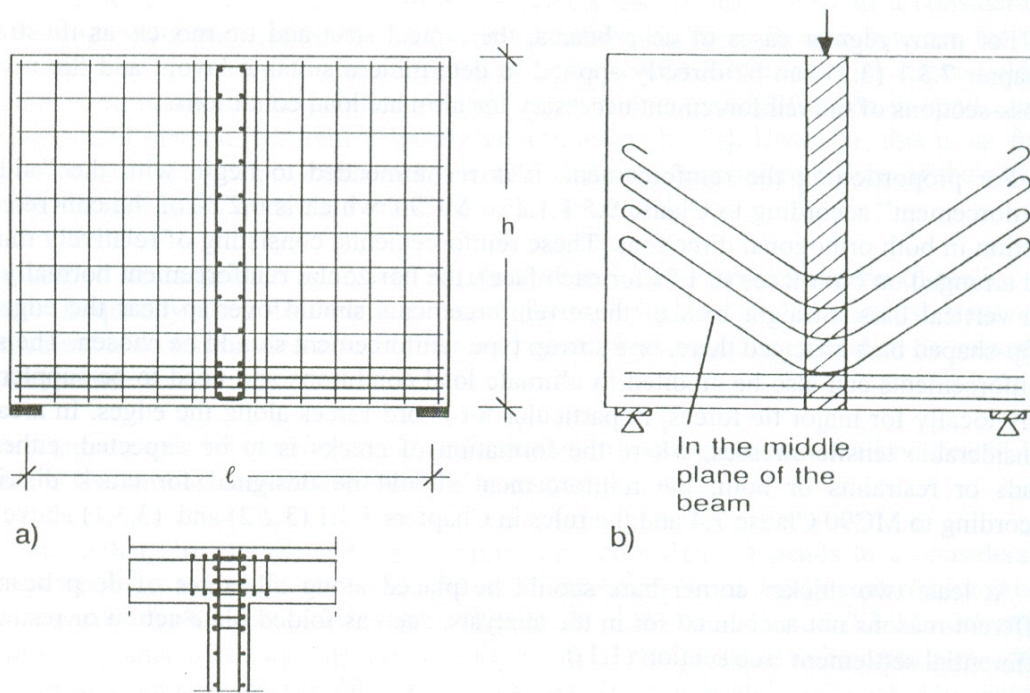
Deep beams with hanging reinforcement for indirect support of another deep beam.
